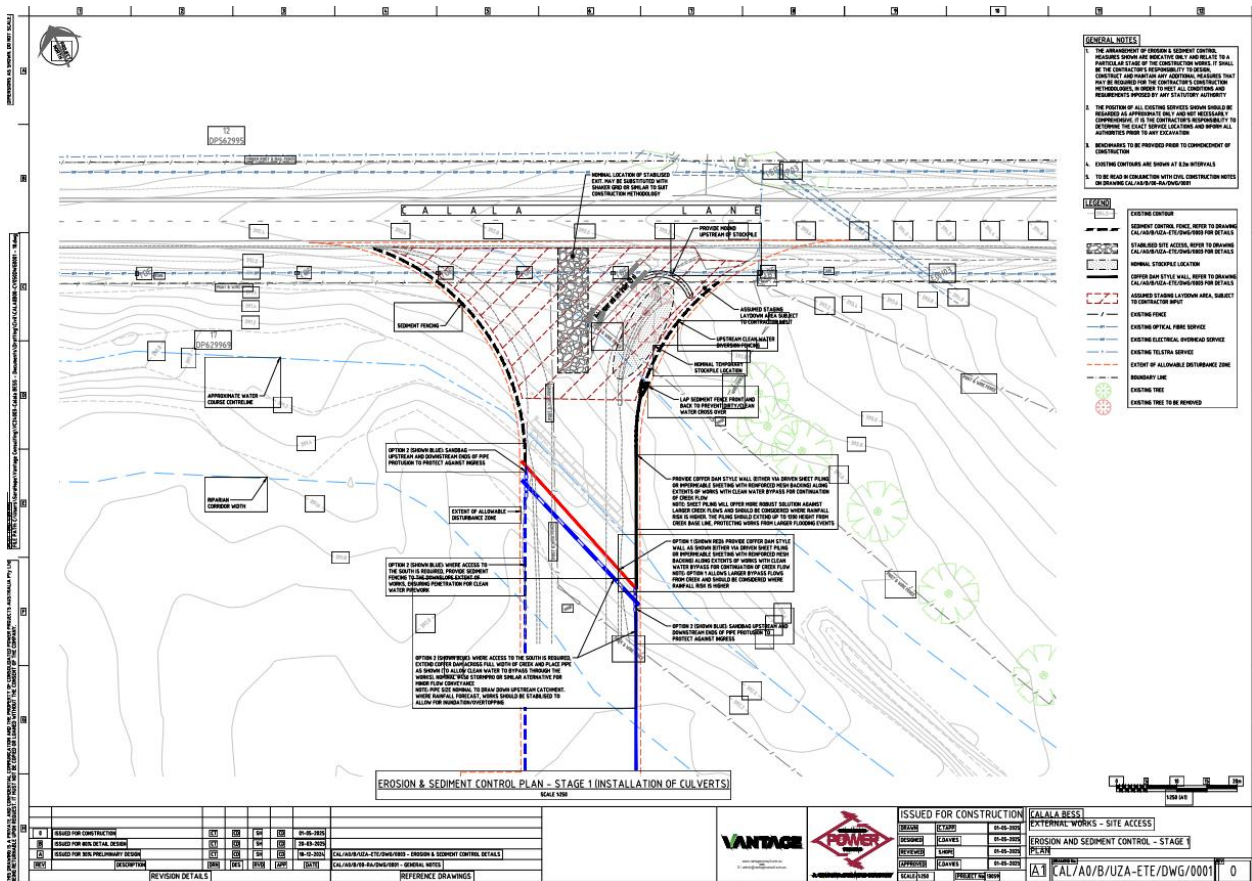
Erosion and Sediment Control Plan prepared by Certified Practitioner (page 3)
